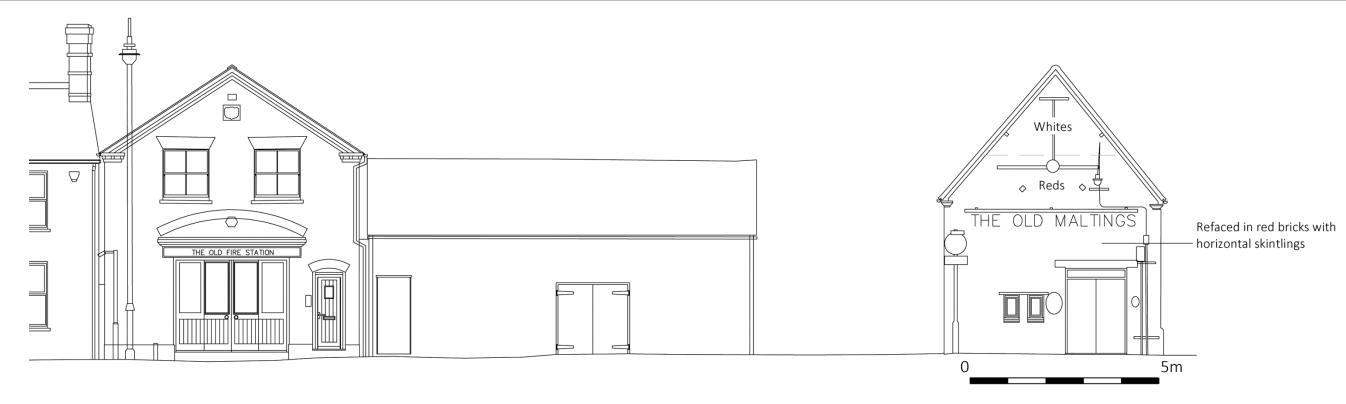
South elevation Old Maltings & barn (scale 1:150)
